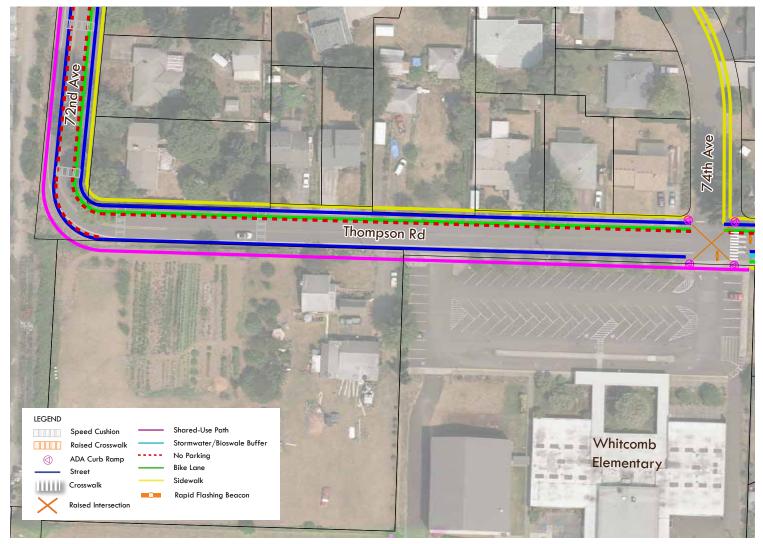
Recommended design for Thompson Road–72nd Avenue to 74th Avenue
